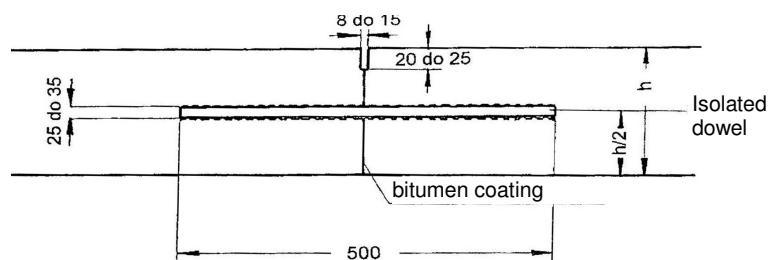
Transverse pressed joint with an installed dowel
